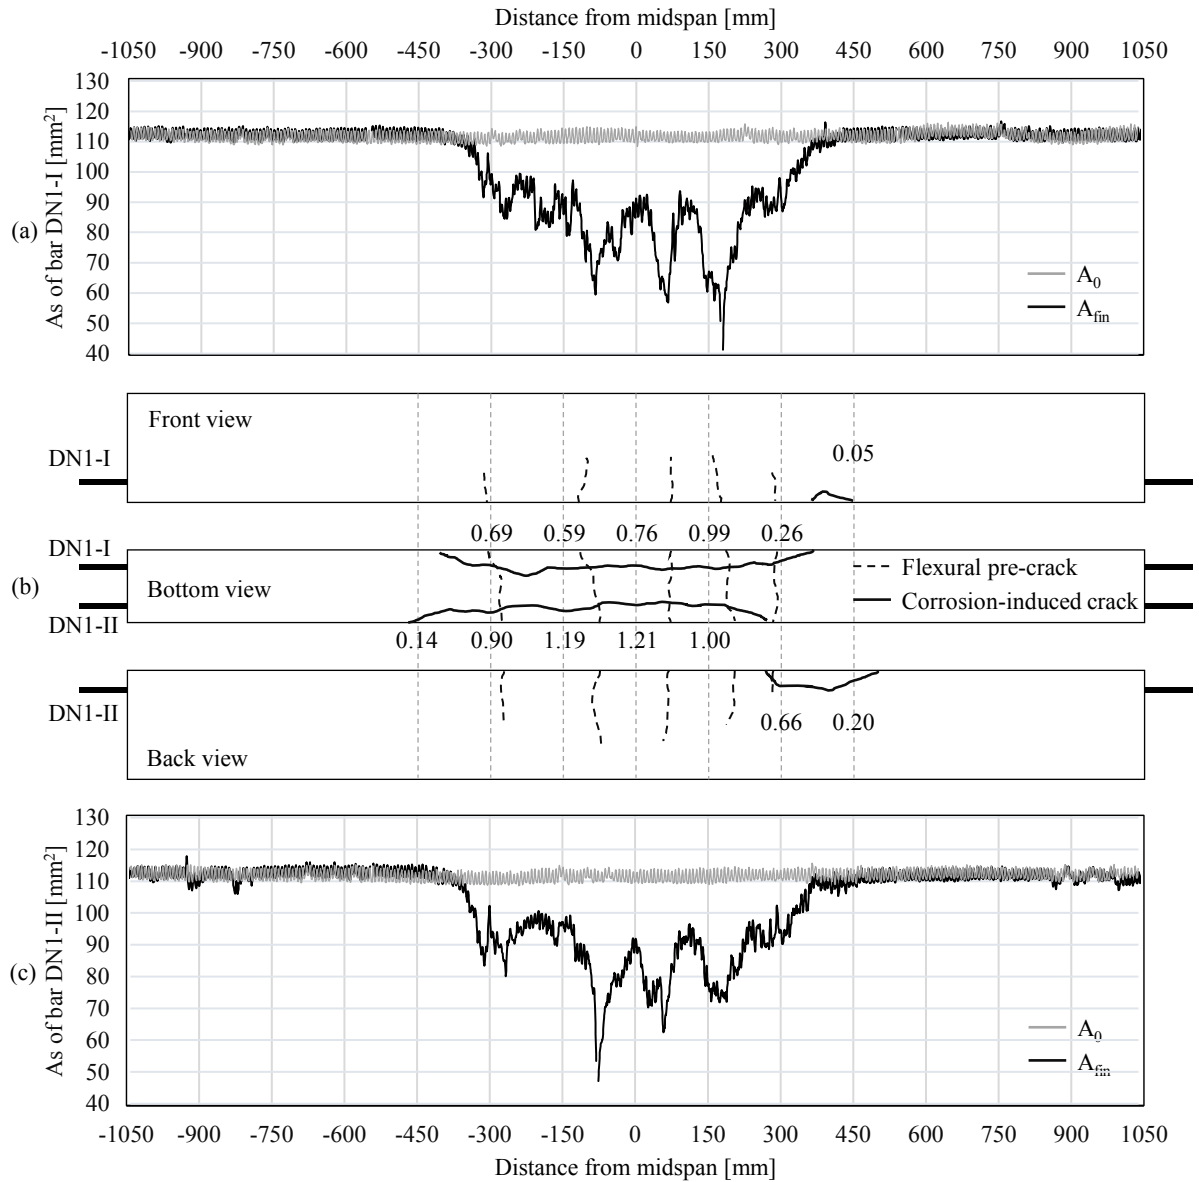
(a, c) Cross-sectional areas of the tensile reinforcement bars I and II in specimen DN1; (b) flexural pre-cracks and corrosion induced cracks, of which the widths (unit in mm) were measured every 150 mm;  $A_s$ —cross-sectional area;  $A_0$ —cross-sectional area of steel bars measured in the initial state before casting beams;  $A_{fin}$ —cross-sectional area of steel bars measured in the final state after taken out from the tested specimens.
